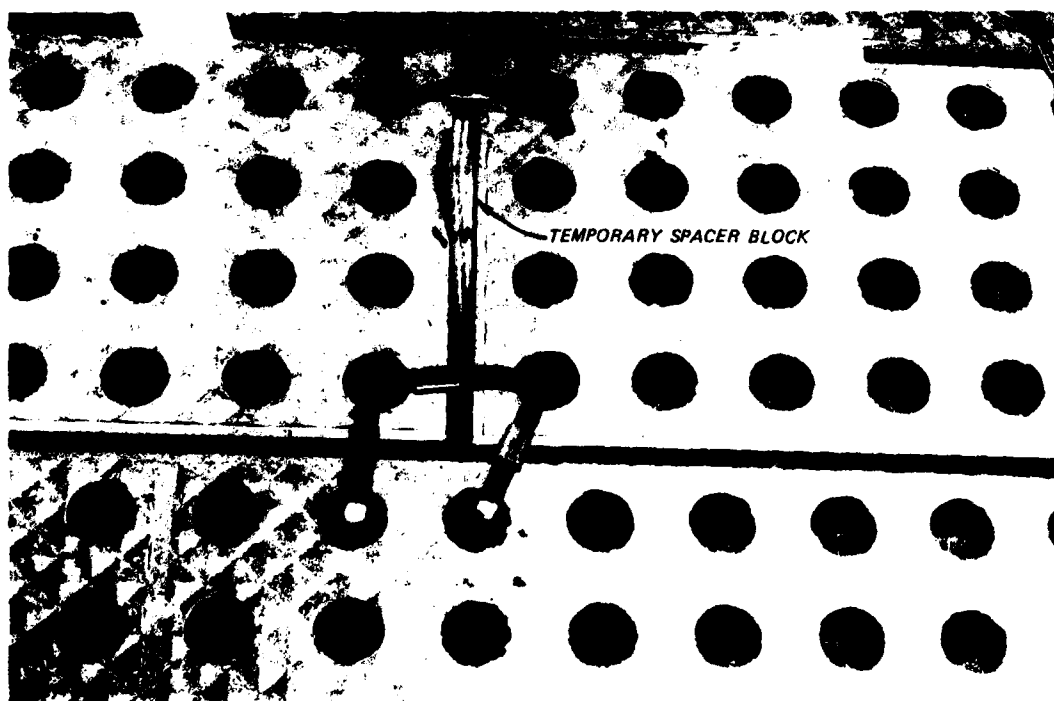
Close-up of a typical completed joint of Sod Saver Blocks, test II
